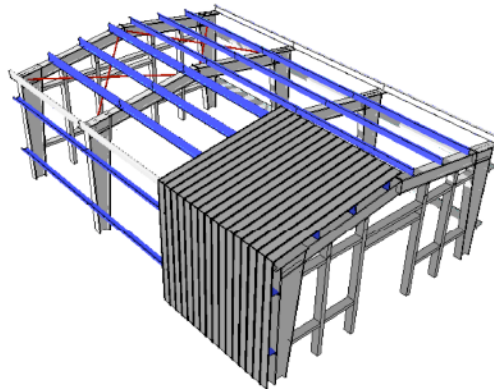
Typical metal building with bare profiled steel panel diaphragms
